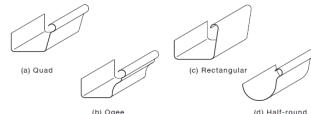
(A) TYPICAL EXTERNAL EAVES GUTTERS
